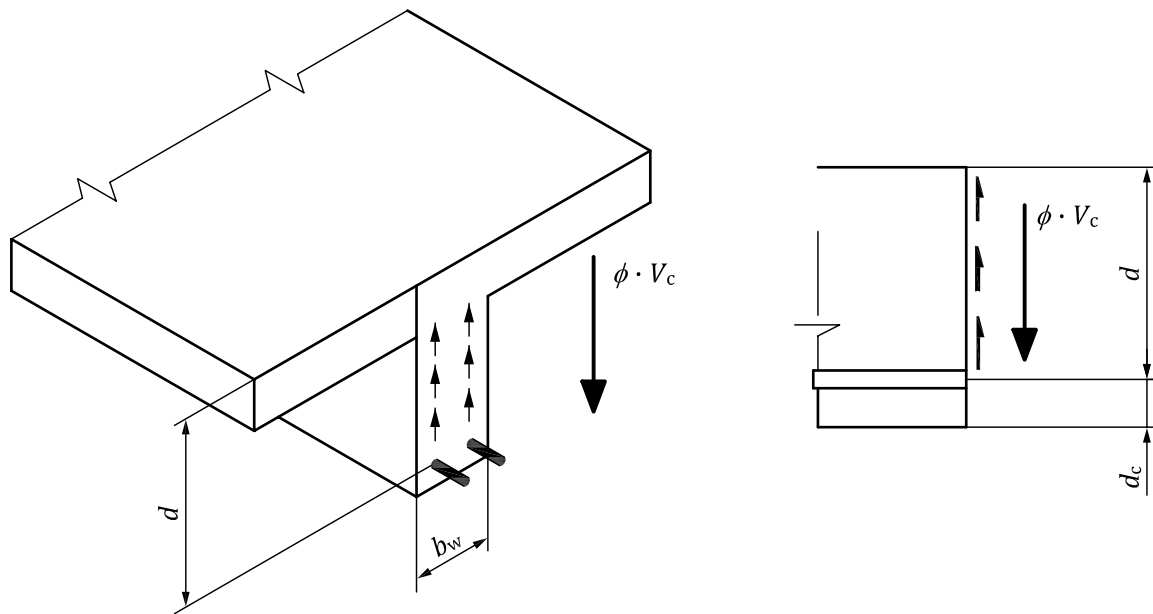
Contribution of concrete to beam-action shear strength in girders, beams, and joists
